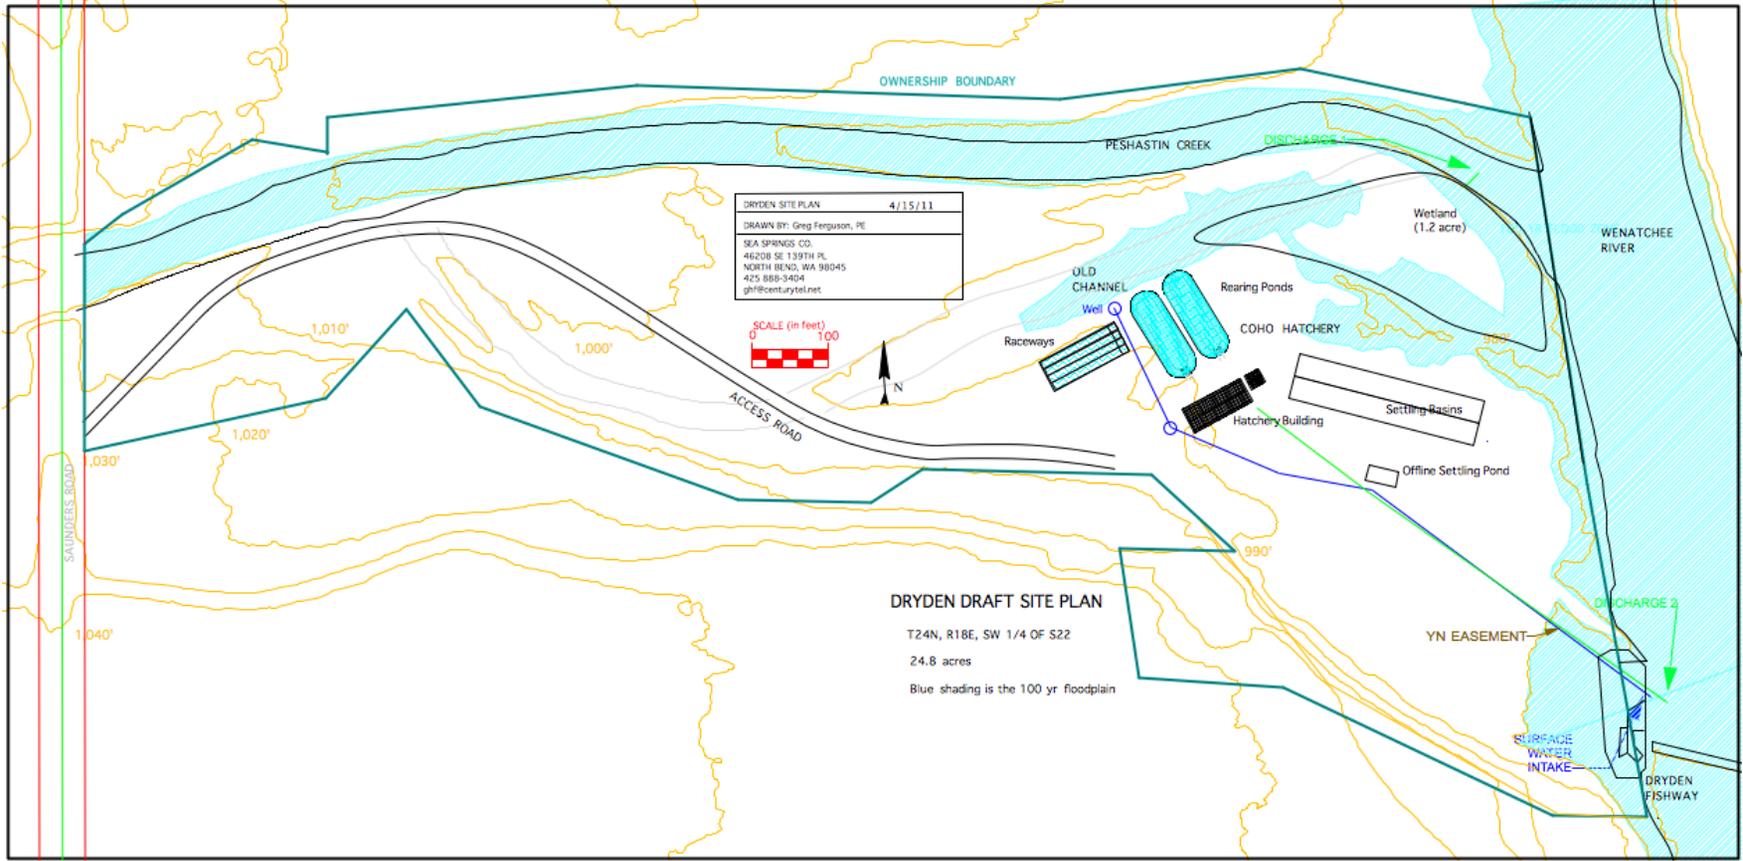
Proposed Dryden Hatchery: Draft Site Plan
